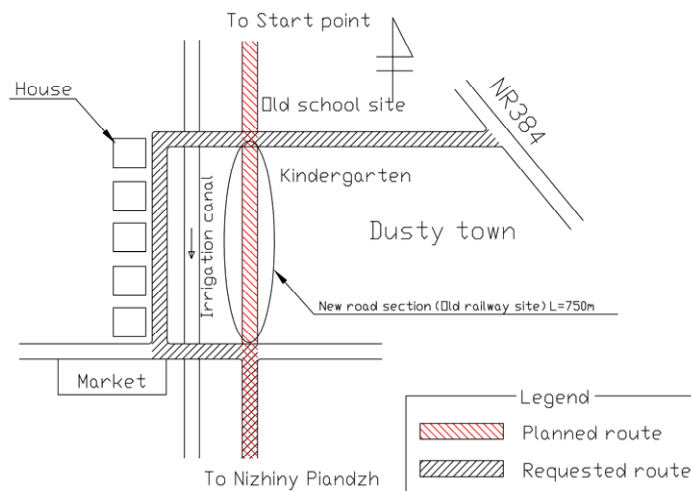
Horizontal road alignment on old railroad
